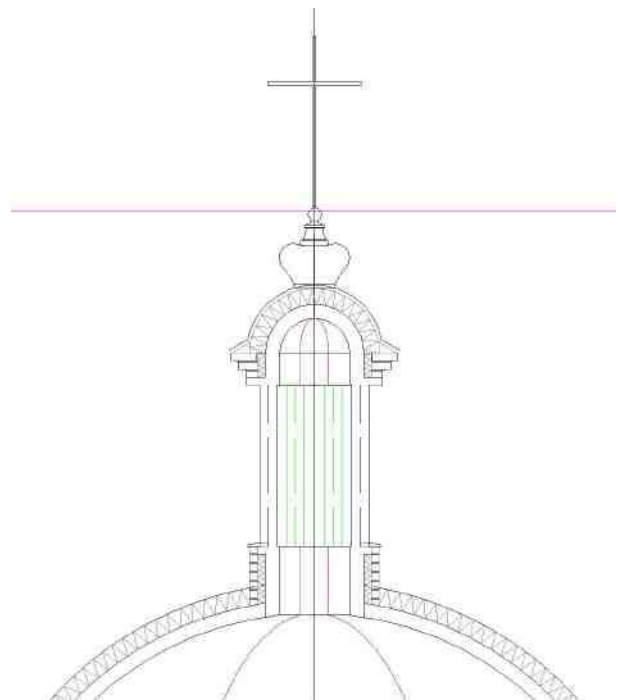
Detail of lantern located on top of masonry dome with reinforced-concrete ribs covering the octagonal side chapel, A4. PB-K-91.
